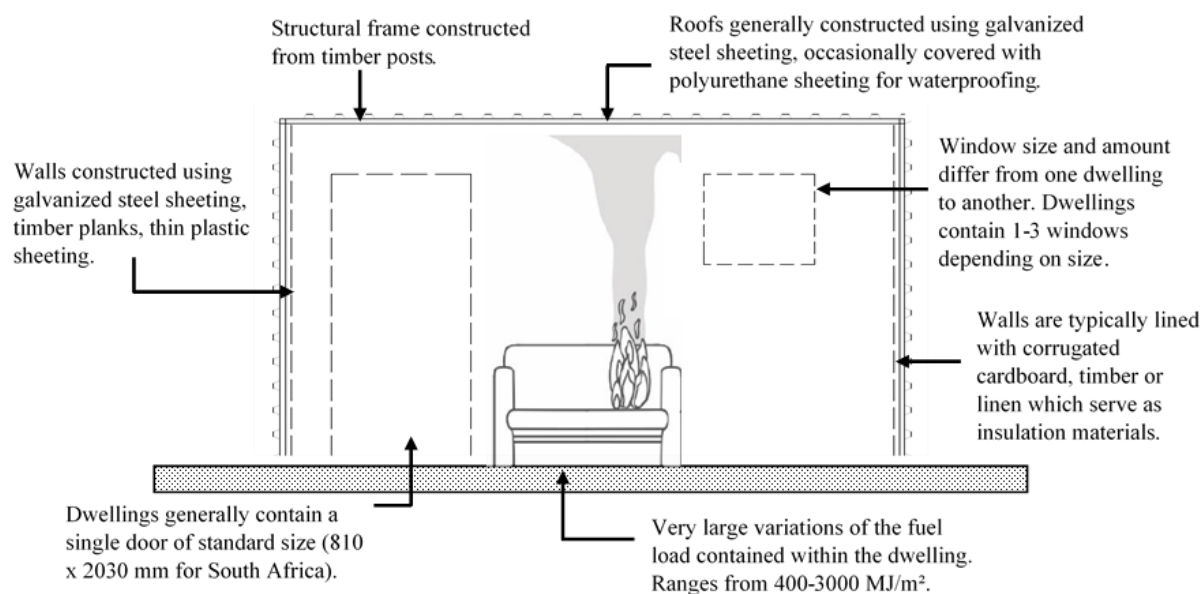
Details pertaining to the layout and construction materials of typical informal settlement dwellings.
